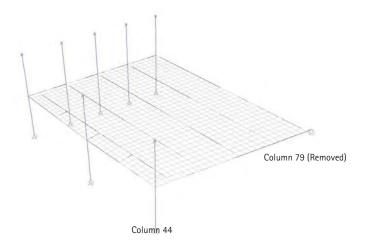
Partial floor SAP2000 potential energy model (northwest view)
